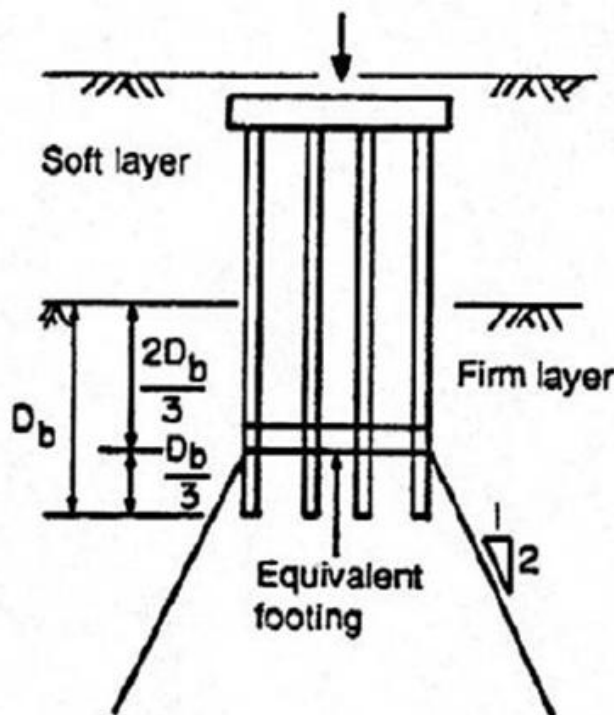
Location of Equivalent Footing (after Duncan and Buchignani, 1976).
